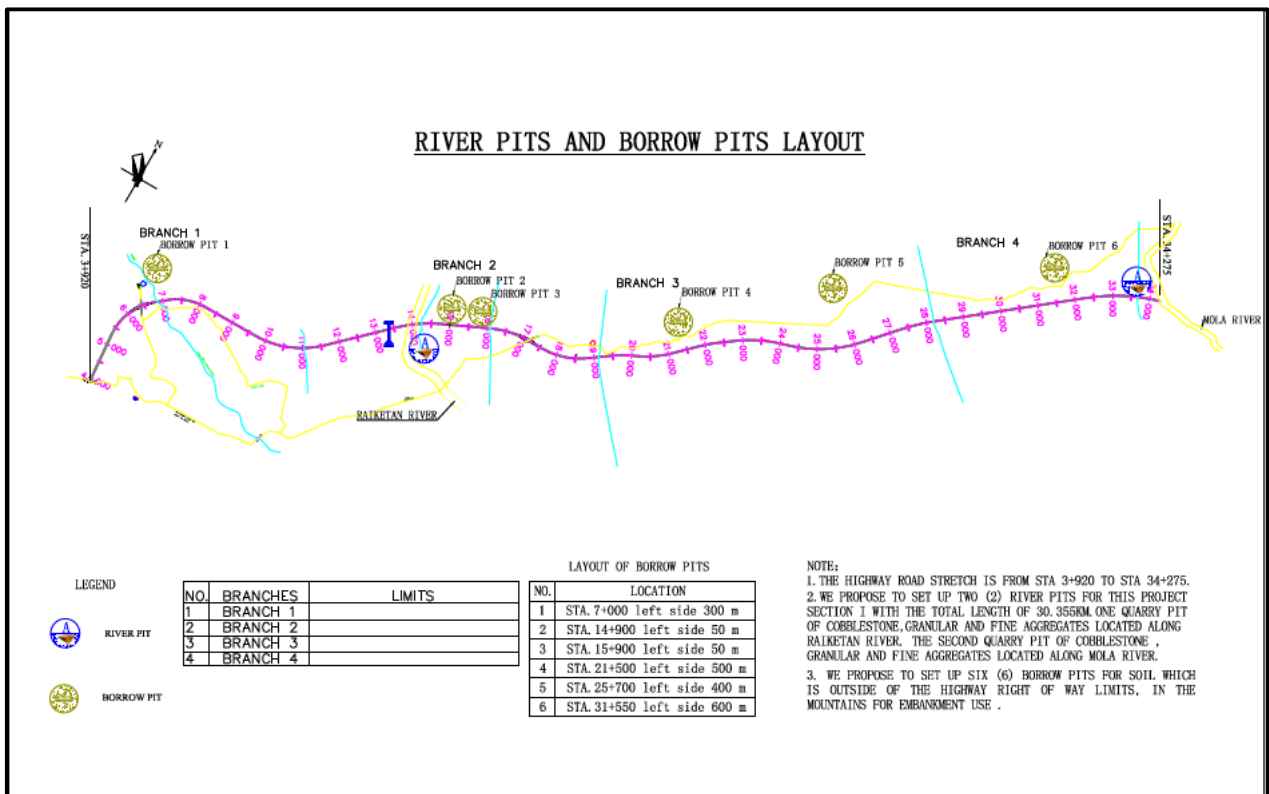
Layout of River Pit in Raiketan River and Facilities in Branch 2
